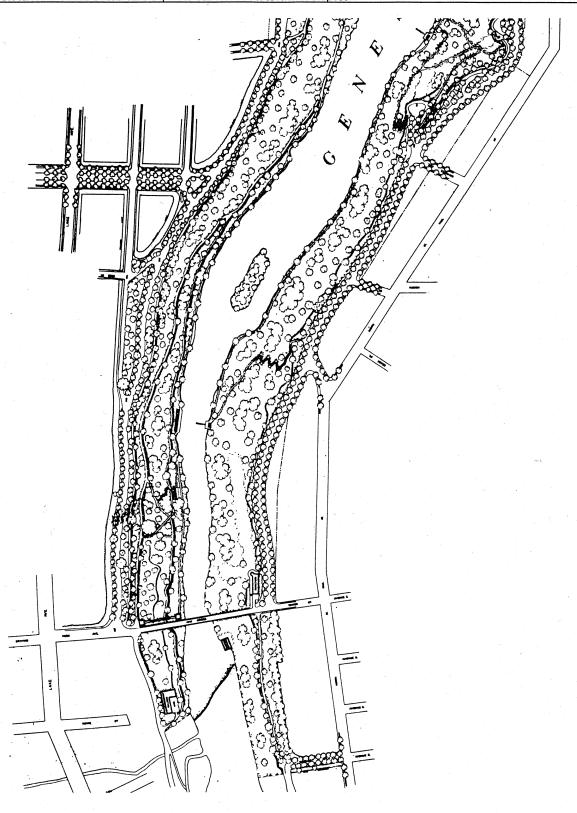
Portion of General Plan for Seneca Park showing section of Seneca Parkway, F.L. Olmsted & Co., Landscape Architects, Brookline, Massachusetts, 1893. Courtesy collection of the Frederick Law Olmsted National Historic Site.
